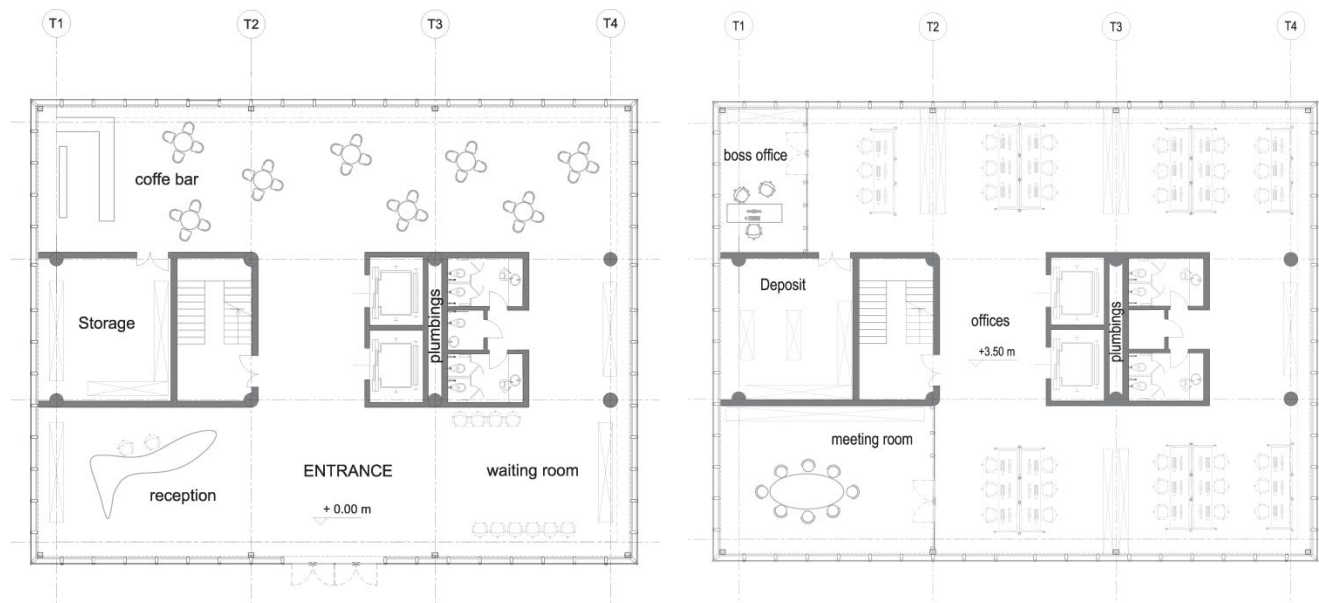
Architectural layout of the lobby area (left) and architectural layout of the office area (right) for the case study.
